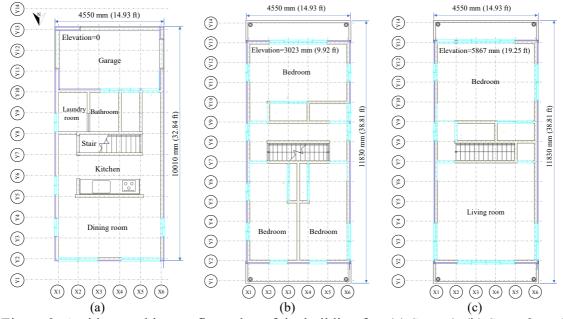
Architectural layout floor plan of the building for: (a) Story 1, (b) Story 2, and (c) Story 3 (Aghababaei et al., 2021).
